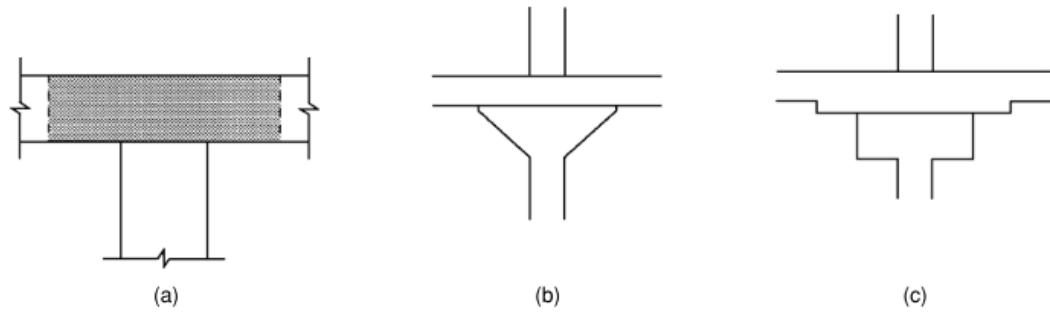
Manipulating element dimensions to resist punching shear (a) deep slab and large column (b) slab with flared column head (c) slab with drop panel and column head (Arya, 2009).
